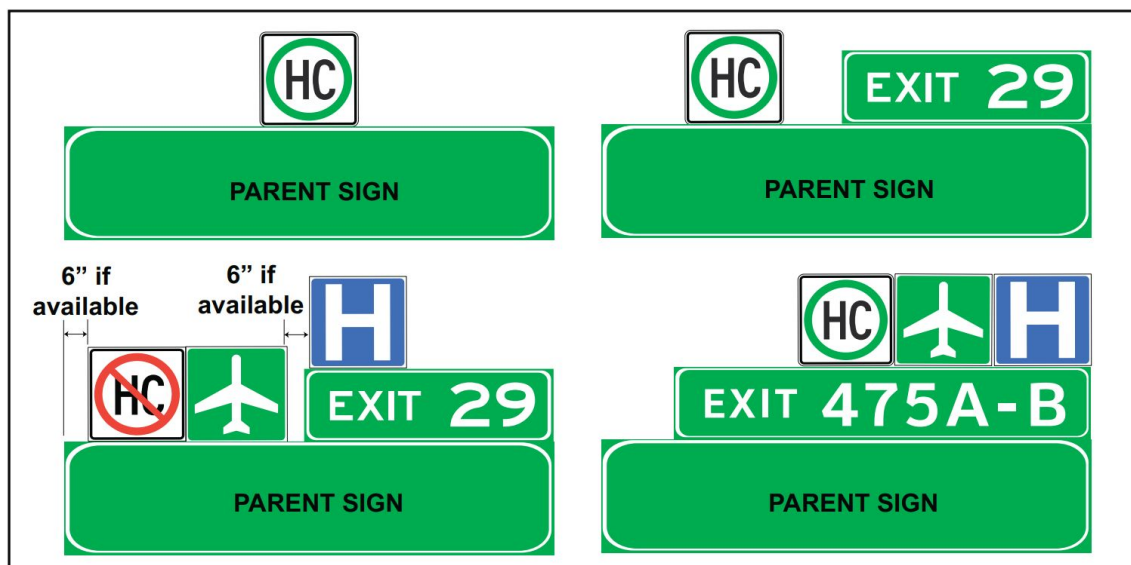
Overhead freeway guide sign and routing plaque typical assemblies.
